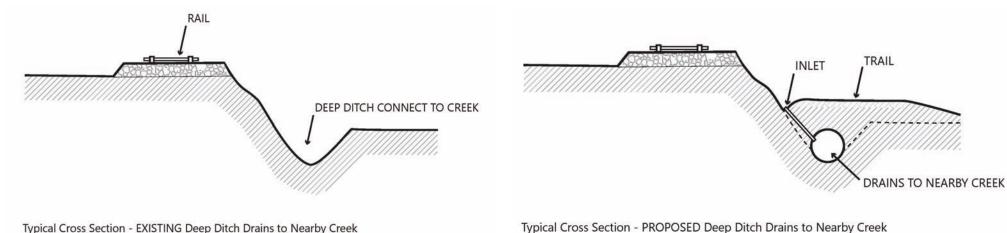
Existing and Proposed Cross-Section showing how the trail might be built atop a deep ditch which connects to a creek
